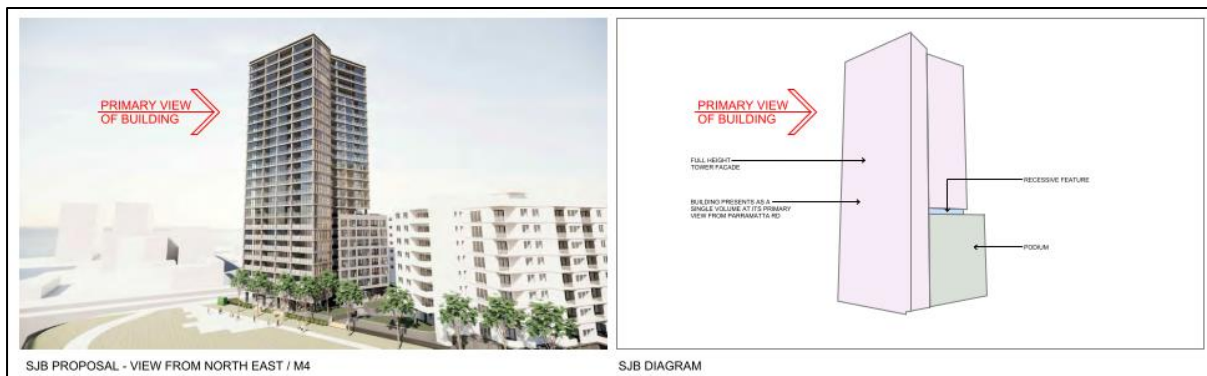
3D Modelling Analysis showing built form of approved SJB design facing south-west
